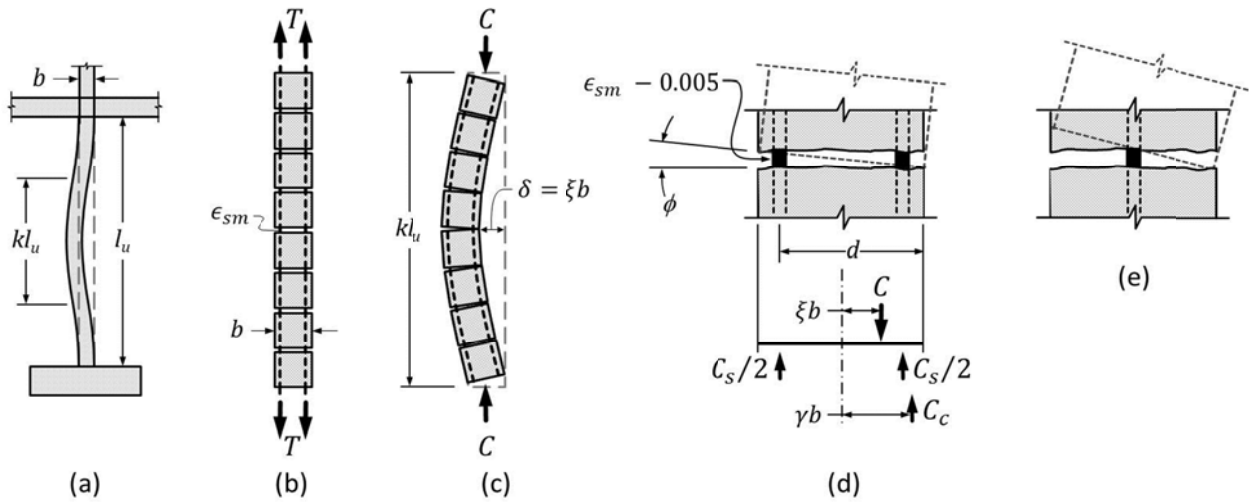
Lateral instability of wall boundary previously yielded in tension (after Moehle, 2014)
